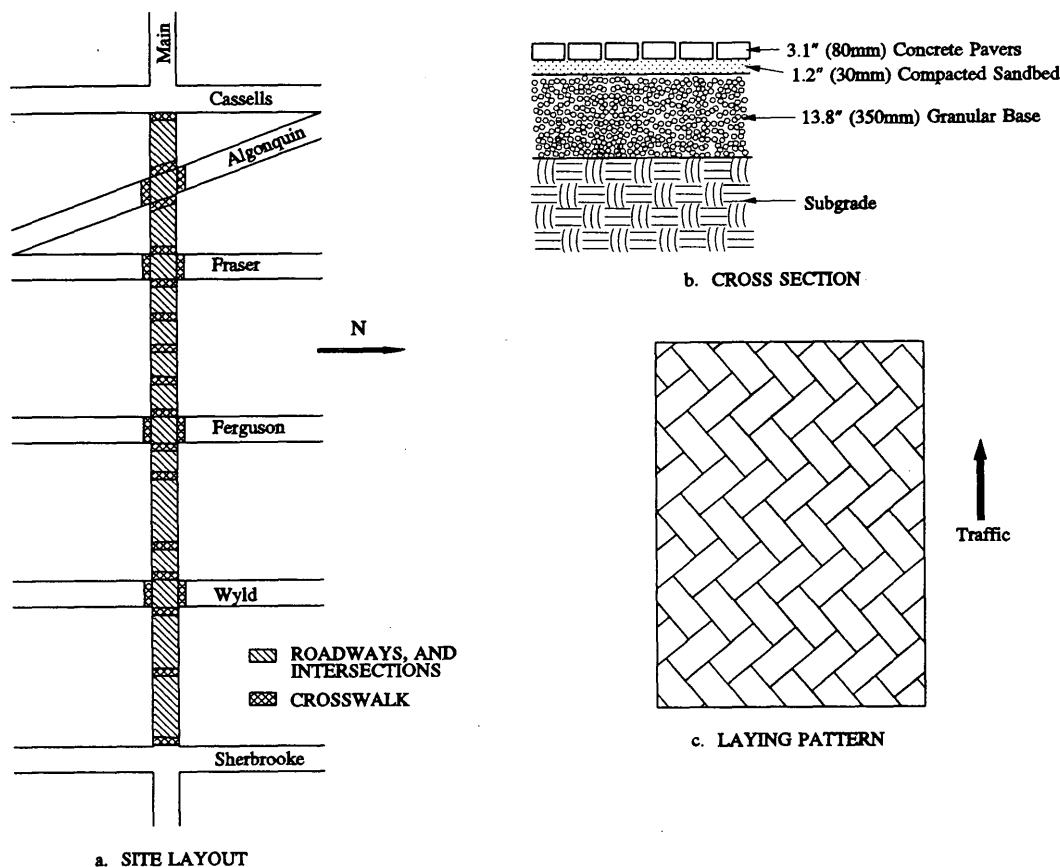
Timmins, Ontario: site layout, pavement cross section, and laying pattern.
